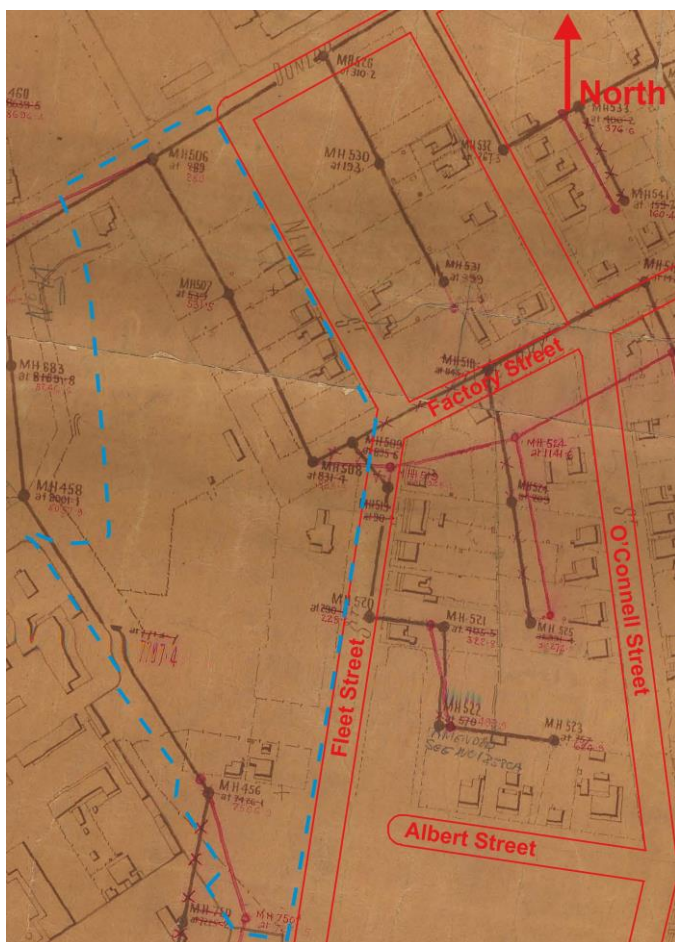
Detail of 1909 Parramatta Sewerage Map, with modern streets overlaid in red; Hospital East Precinct is outlined in blue. There was one house on Dunlop Street, six houses on New Street, one house on Fleet Street and two cottages west of Fleet Street on the former alignment of Albert Street. Sydney Water Plans, Government Contract 681, Sheet 1.
